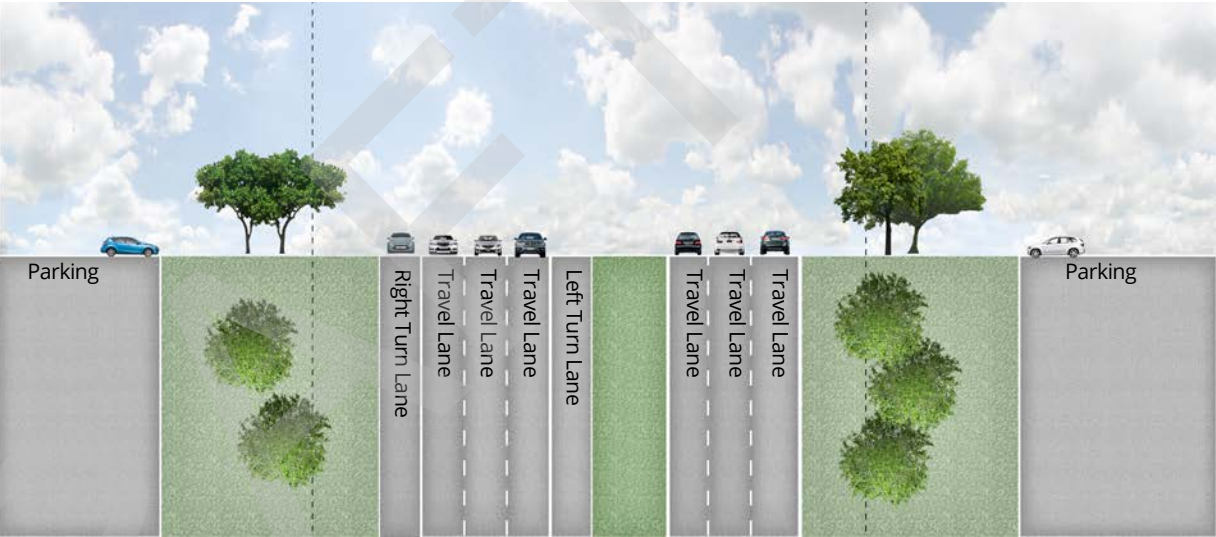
PROPOSED COUNTY ROAD 10 SECTION
